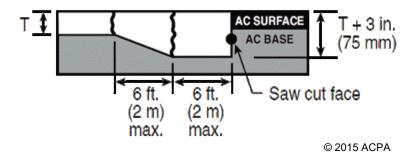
Example "specialty" joint detail for transition between concrete and asphalt paving (ACPA 2015).
